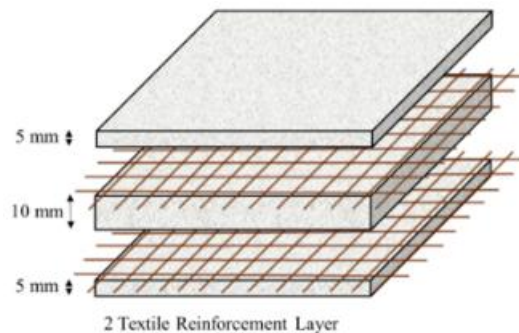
D.H. Murcia et.al. textile reinforcement incorporated in between the concrete
